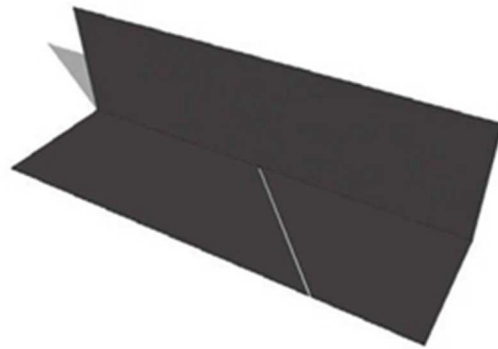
STEP 3 – FOLDING THE MEMBRANE CORNER AND STICKING THE APP150 TAPE ONTO THE JOINT
